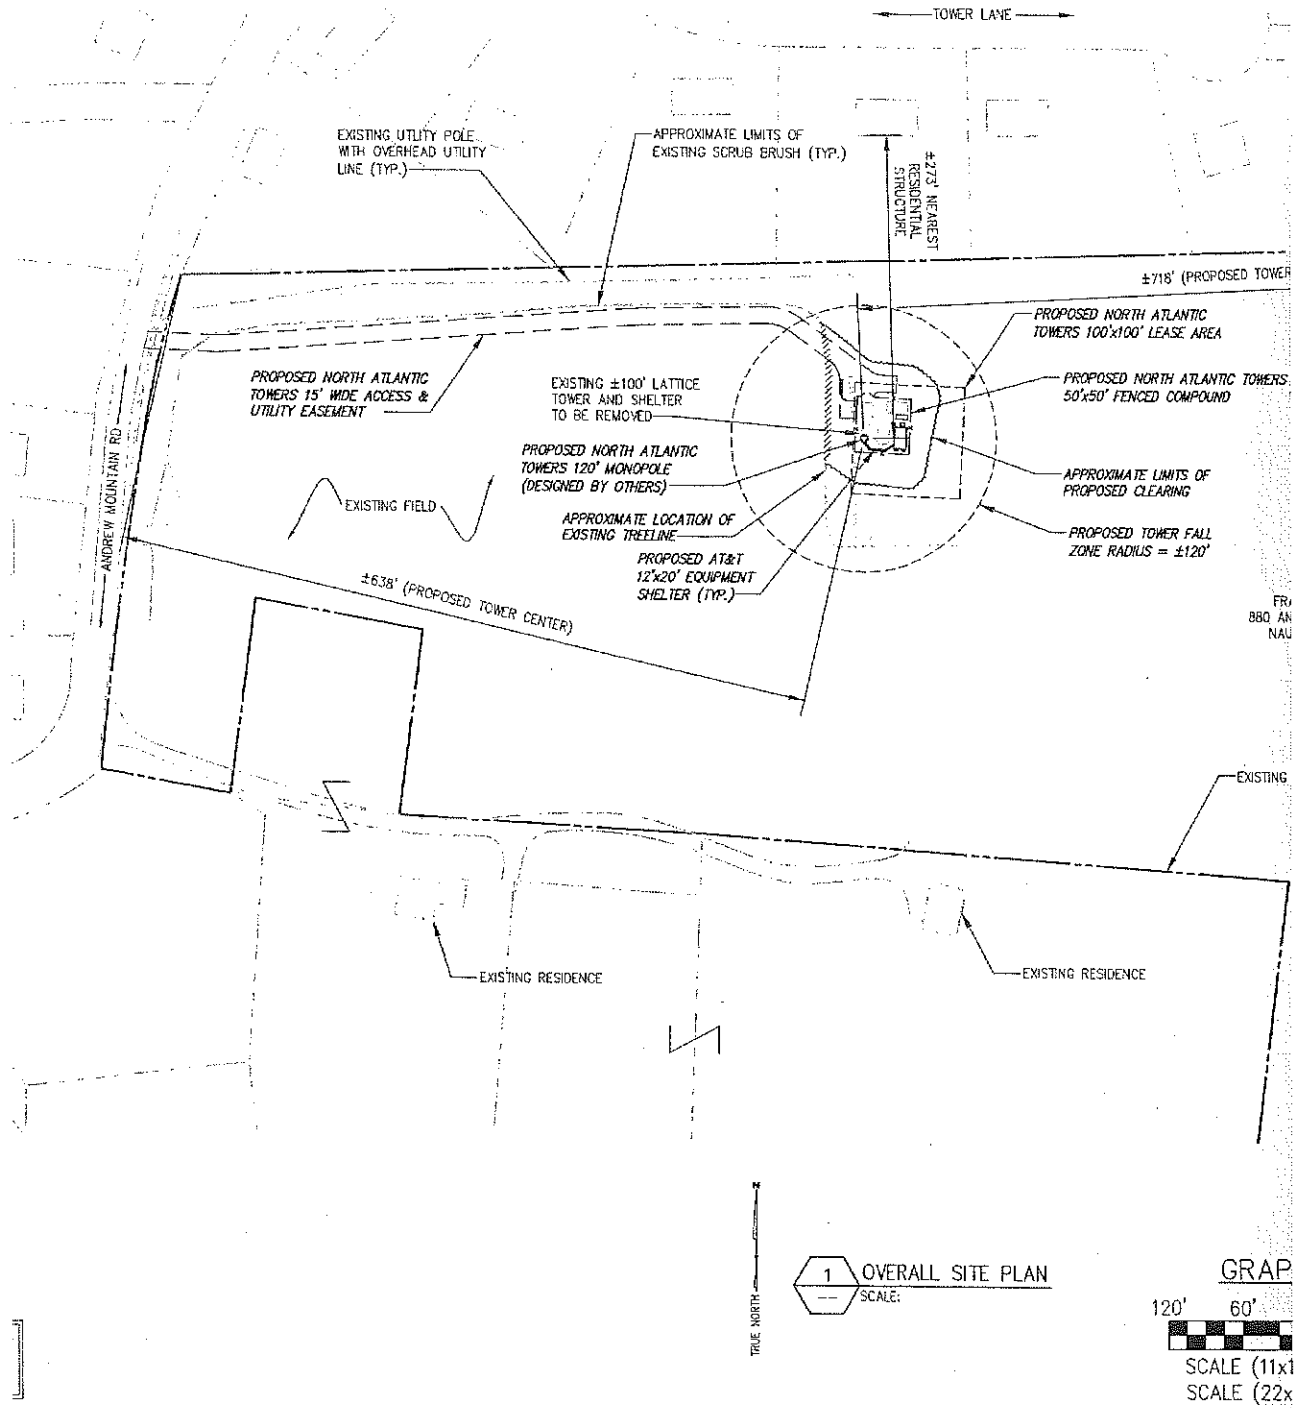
Site plan with access road south of shrub vegetation. (NAT/AT&T 4)
